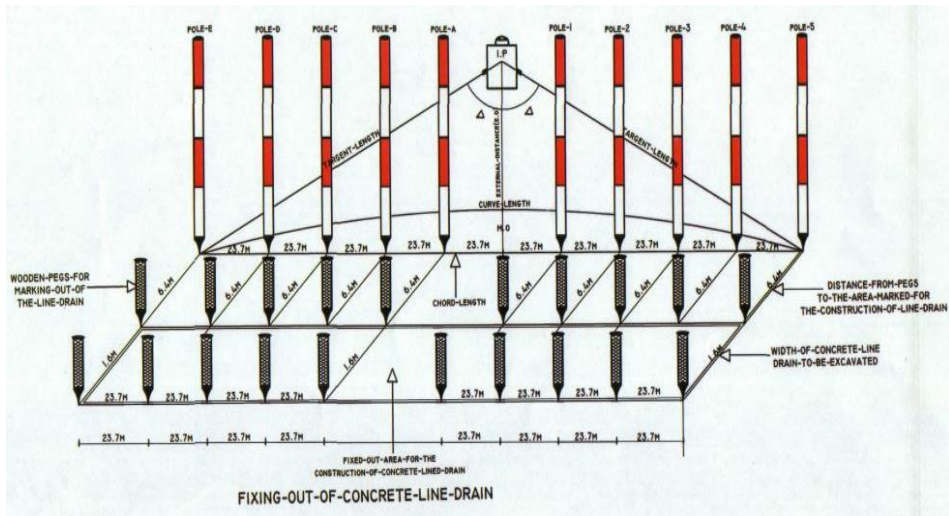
The fixing out of concrete line-drain from the deflection angles
